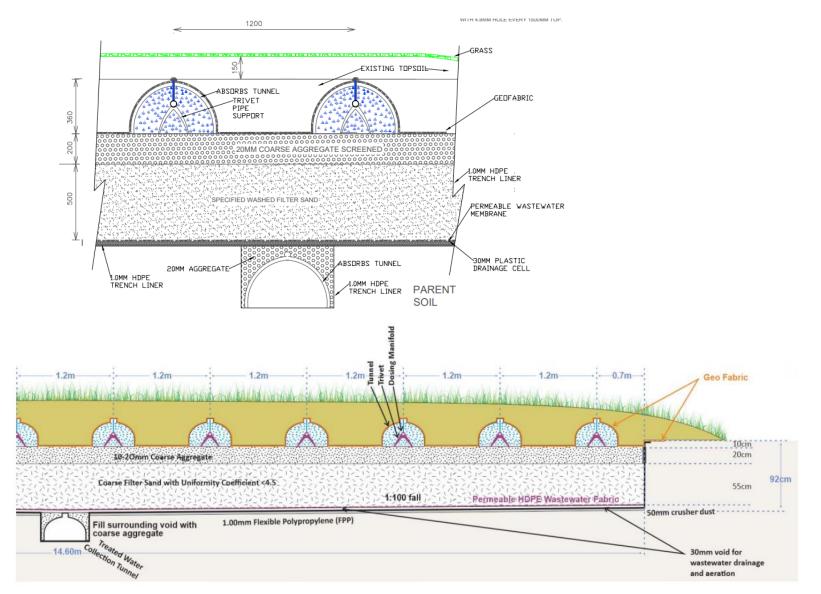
Cross section layout of secondary wastewater treatment filter beds (ABSORB beds depicted in Figure 7)
